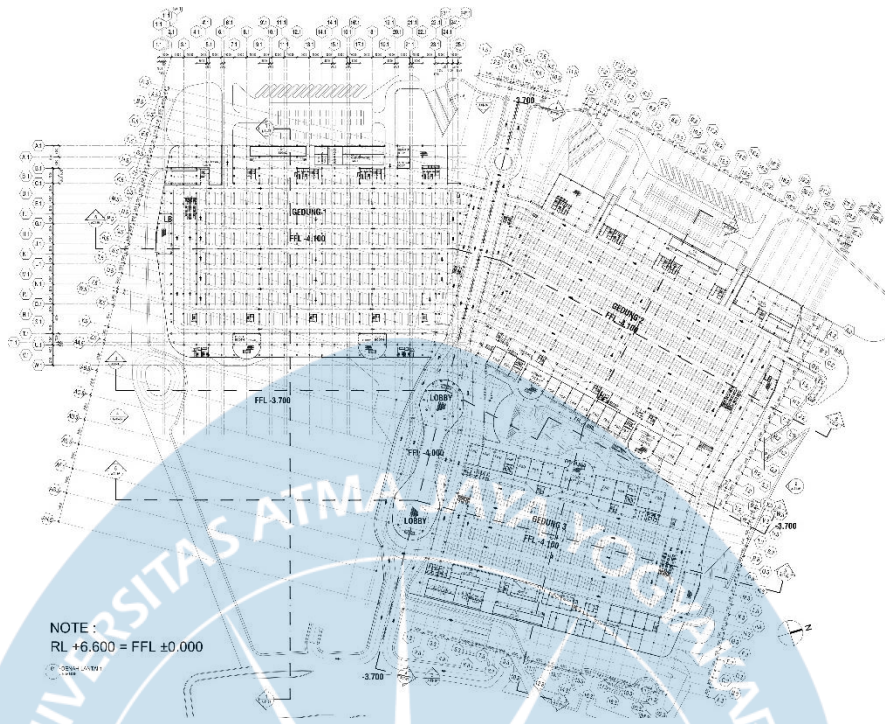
Convention and Exhibition Centre Building Siteplan
